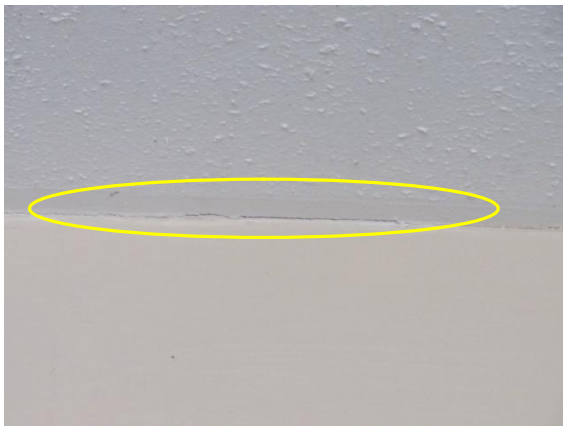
Hairline Cracking along Wall and Ceiling Lining Joint
